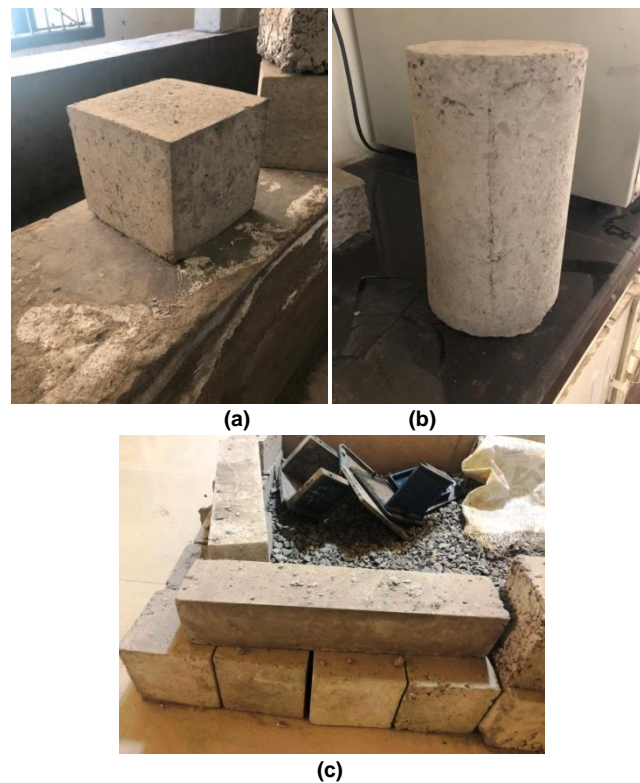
(a) cube specimen, (b) cylinder specimen, (c) beam specimen
